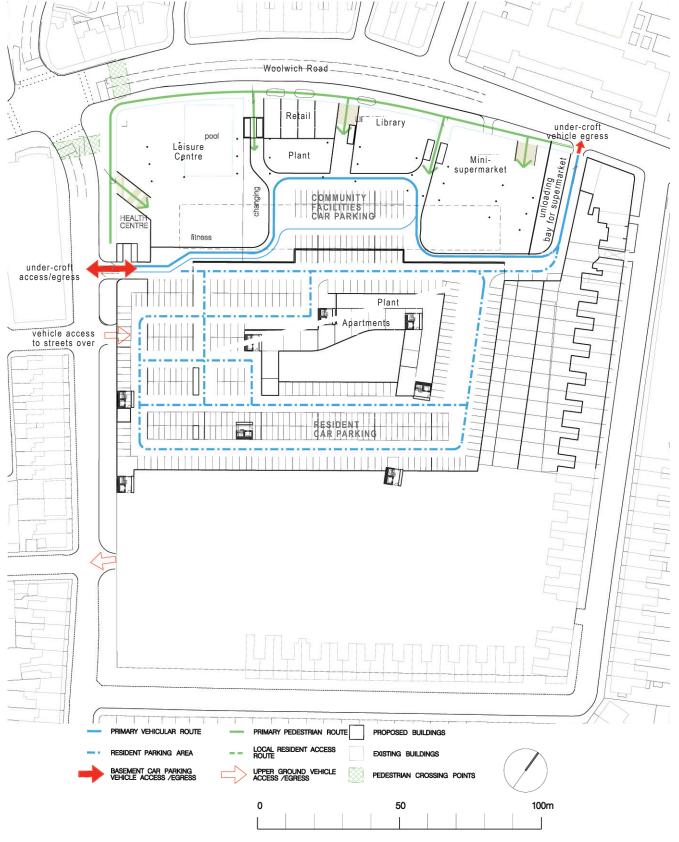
Lower Ground Floor - Woolwich Road level and Under-croft Parking
